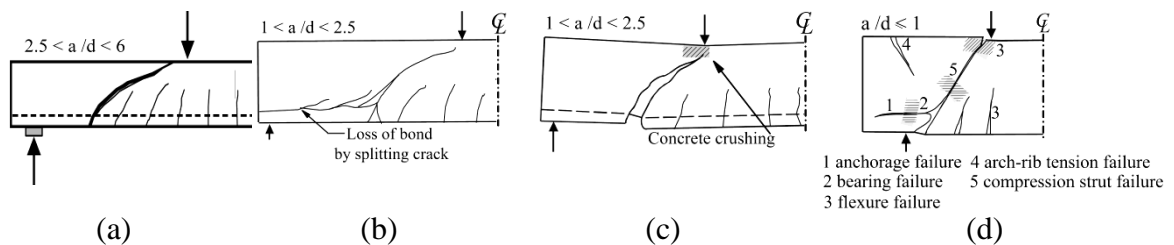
(a) Diagonal tension failure mode in slender beams, (b) Shear-tension and (c) shear compression failure modes in short-span beams, and (d) shear failure mode in deep beams subjected to four point bending test (ASCE-ACI 426, 1973).
